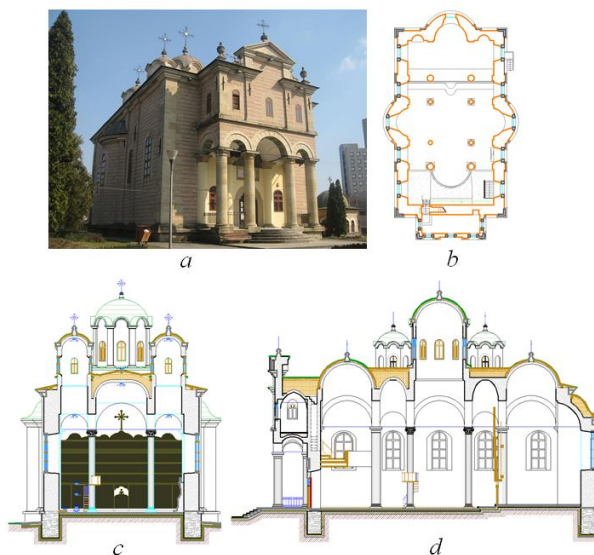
Bărboi Church: *a* – main facade; *b* – the plan of the walls; *c* – transversal section; *d* – longitudinal section (5).
